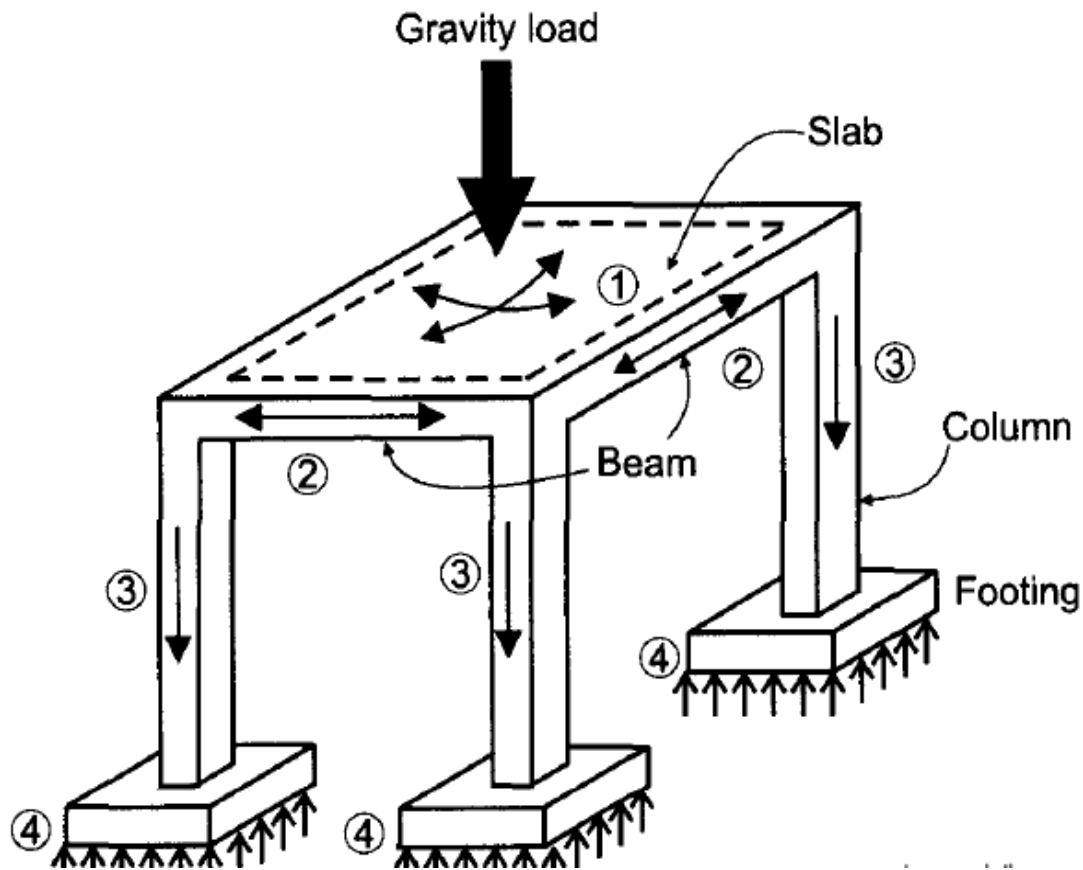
An isometric view of a concrete structure showing a gravity load path.
